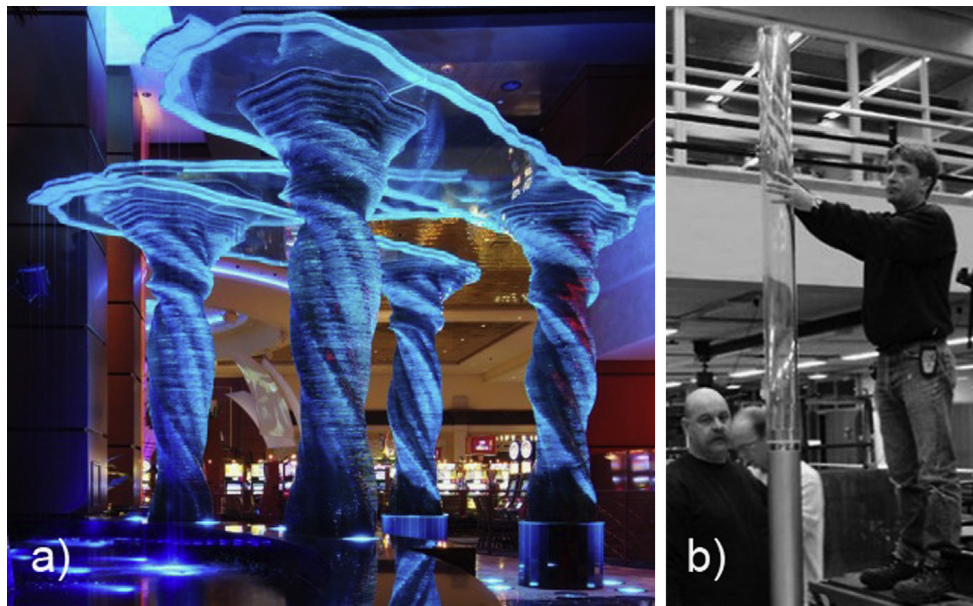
Two types of glass columns: a. stacked columns and b. glass tubular column [Pariafsai, 2016]
